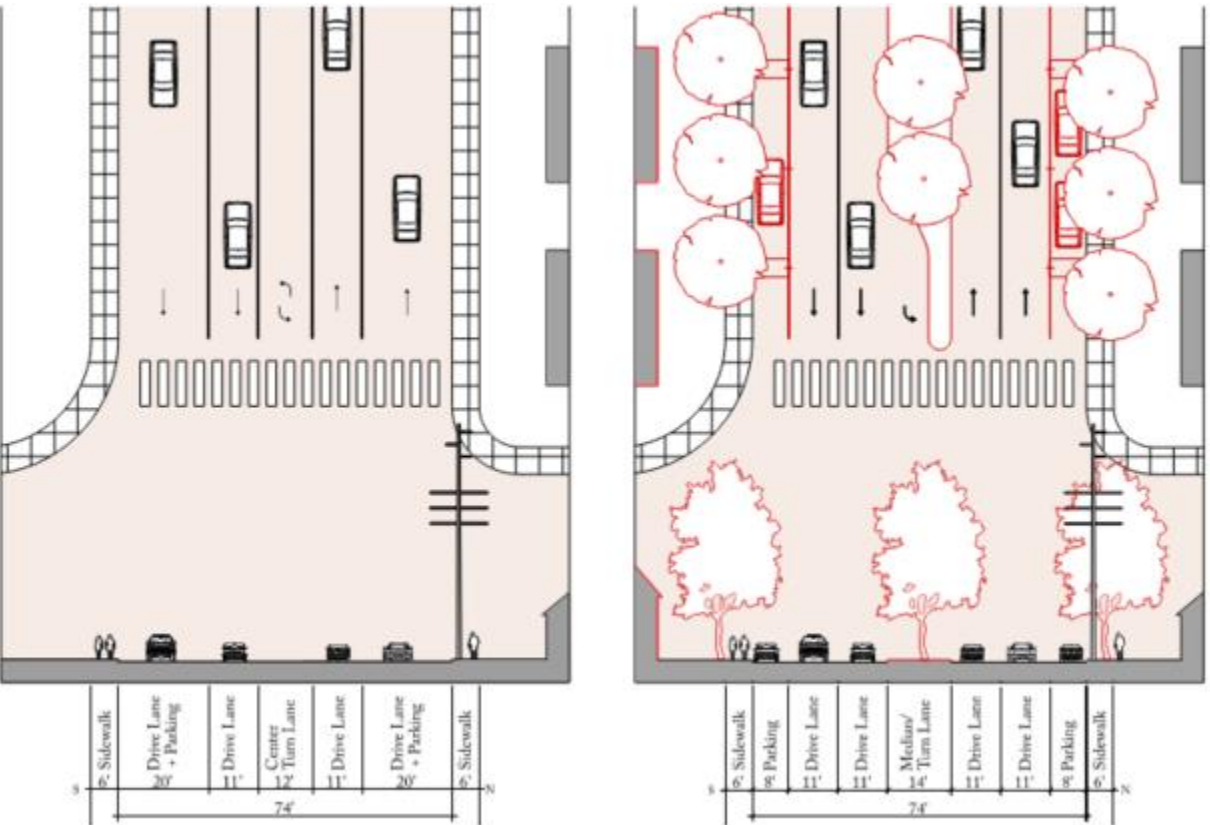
Greenwood Avenue -- South of Washington Boulevard
